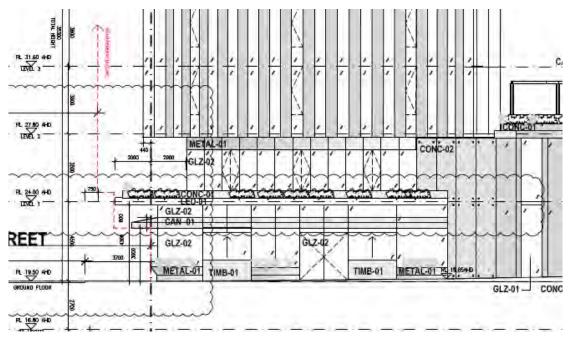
Excerpt of advertised east elevation showing proposed encroachment - dashed line shows Title boundary
